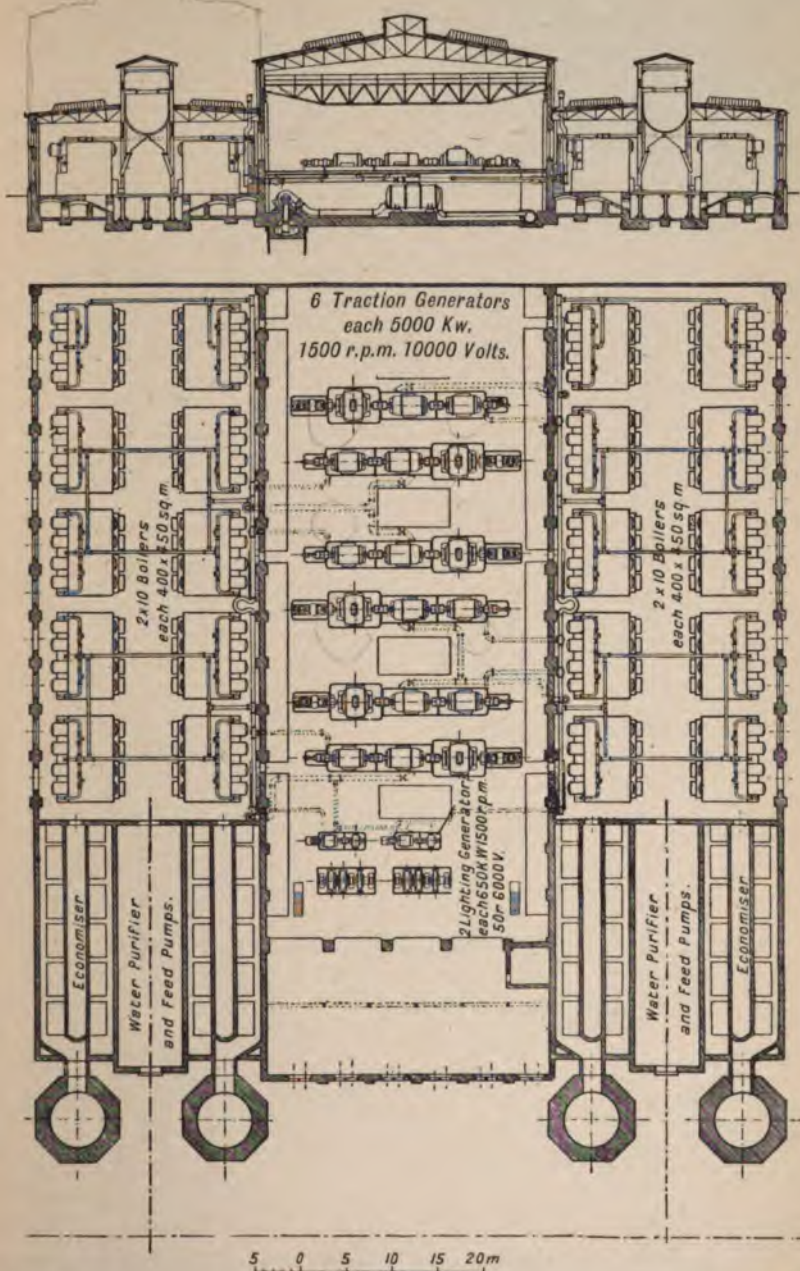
PLAN AND ELEVATION OF POWER HOUSE PROPOSED FOR SUPPLYING ELECTRICITY FOR OPERATING THE BERLIN ELEVATED RAILWAYS.
